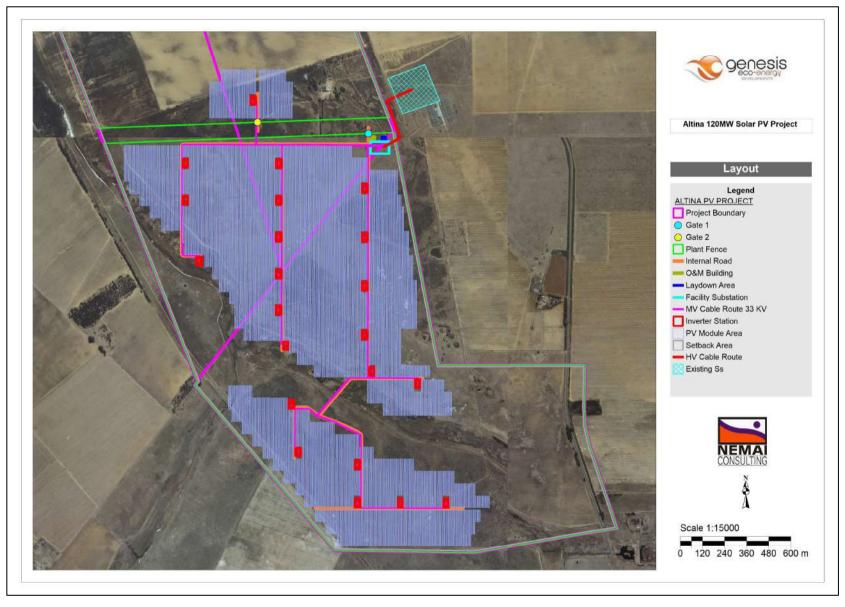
Project Layout Alternative 1 (As provided by Nemai Consulting)
